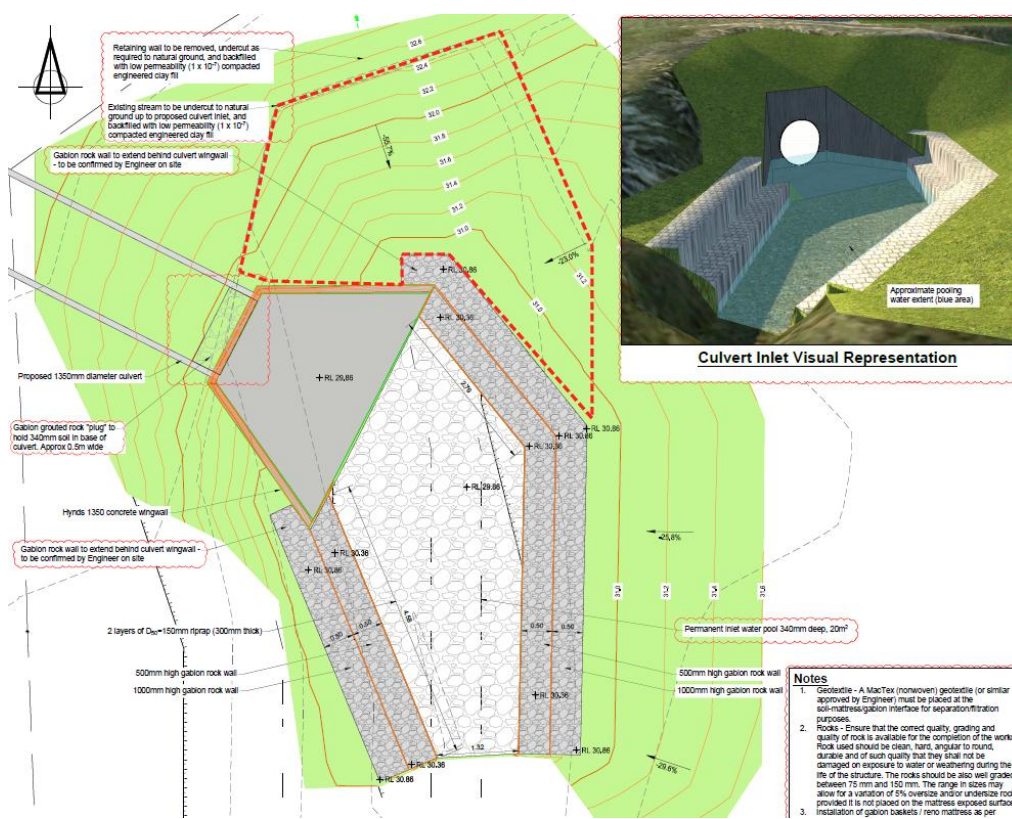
Proposed gabion rock walls at new culvert inlet, with permanent water pool
